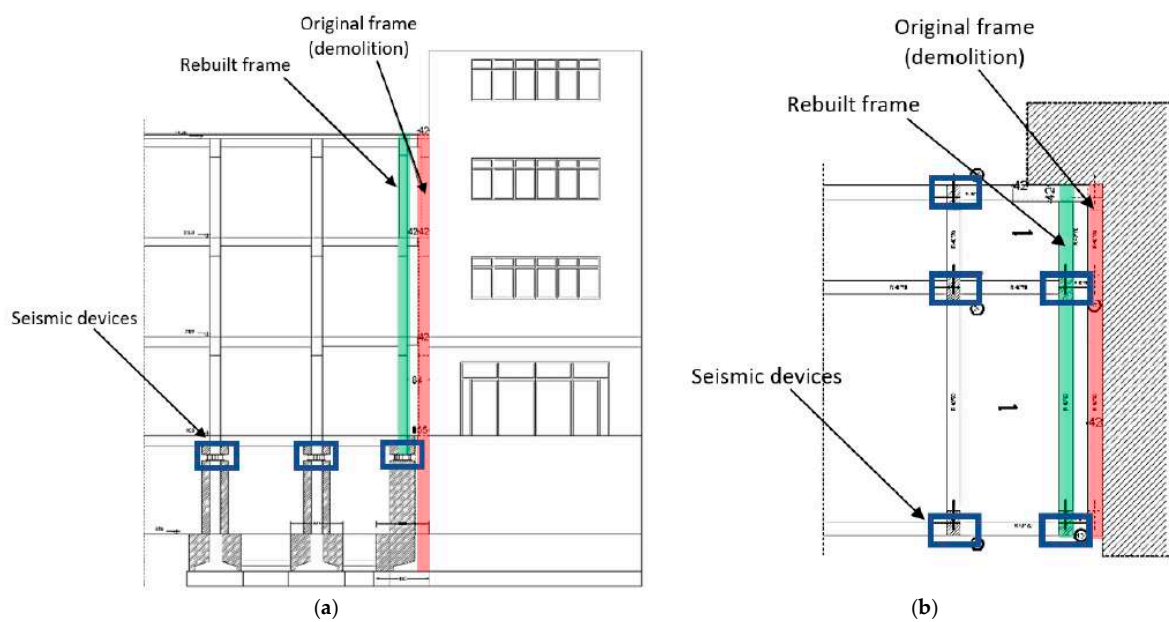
Detail of seismic joint: (a) vertical cross-section and (b) plan view.
